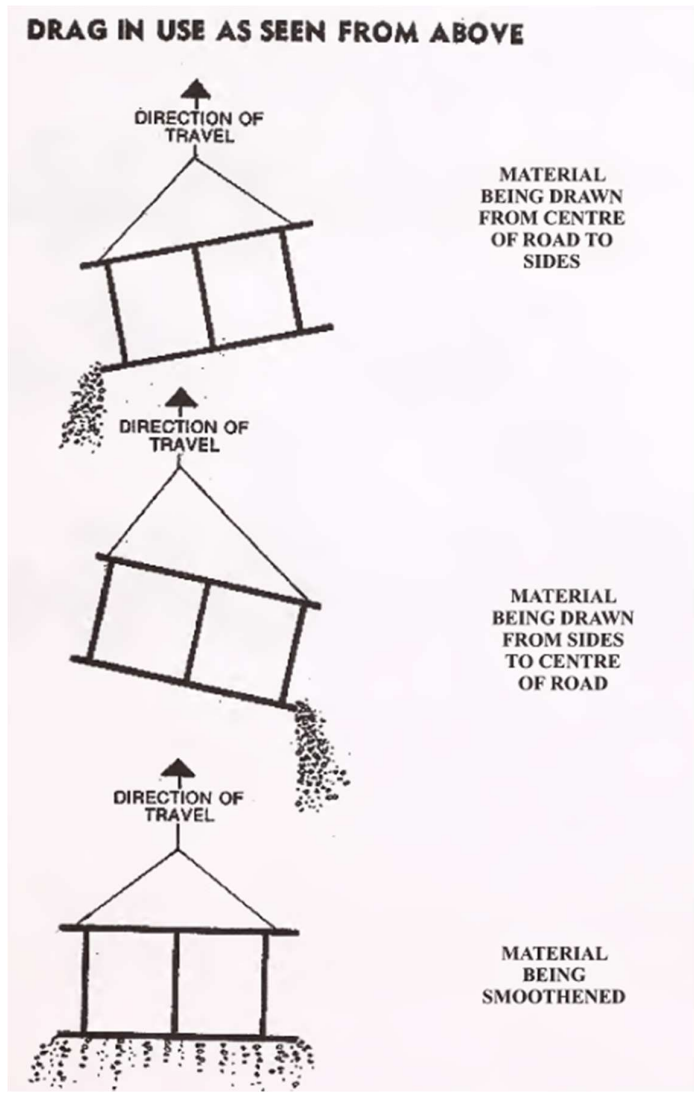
Use of Drag in Drawing Material from Different Parts of Pavements (Source: Unsealed Roads : A Manual of Repair and Maintenance for Pavements, National Roads Board, New Zealand)
